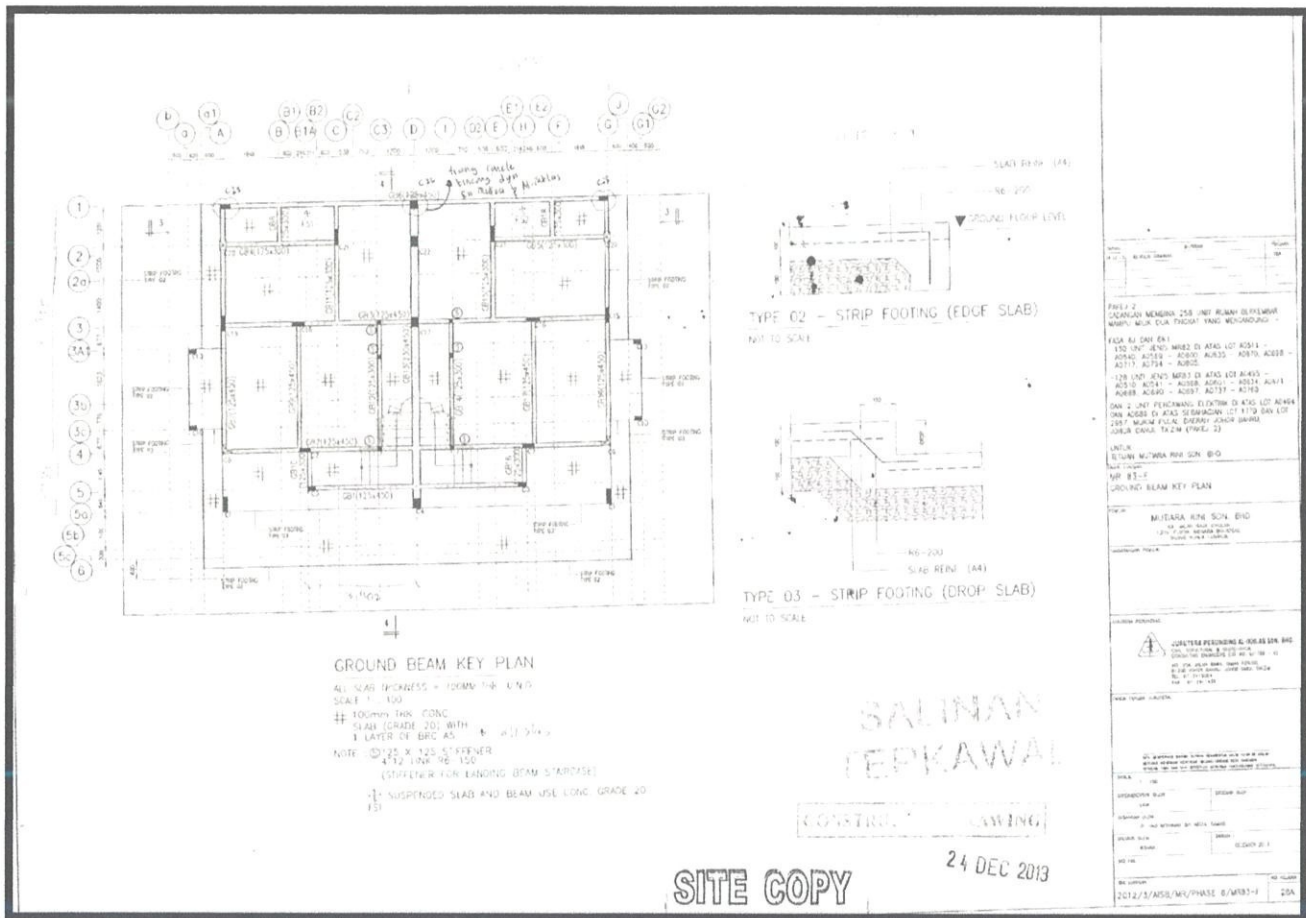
Example of key plan structure drawing MR83 (Footing)
